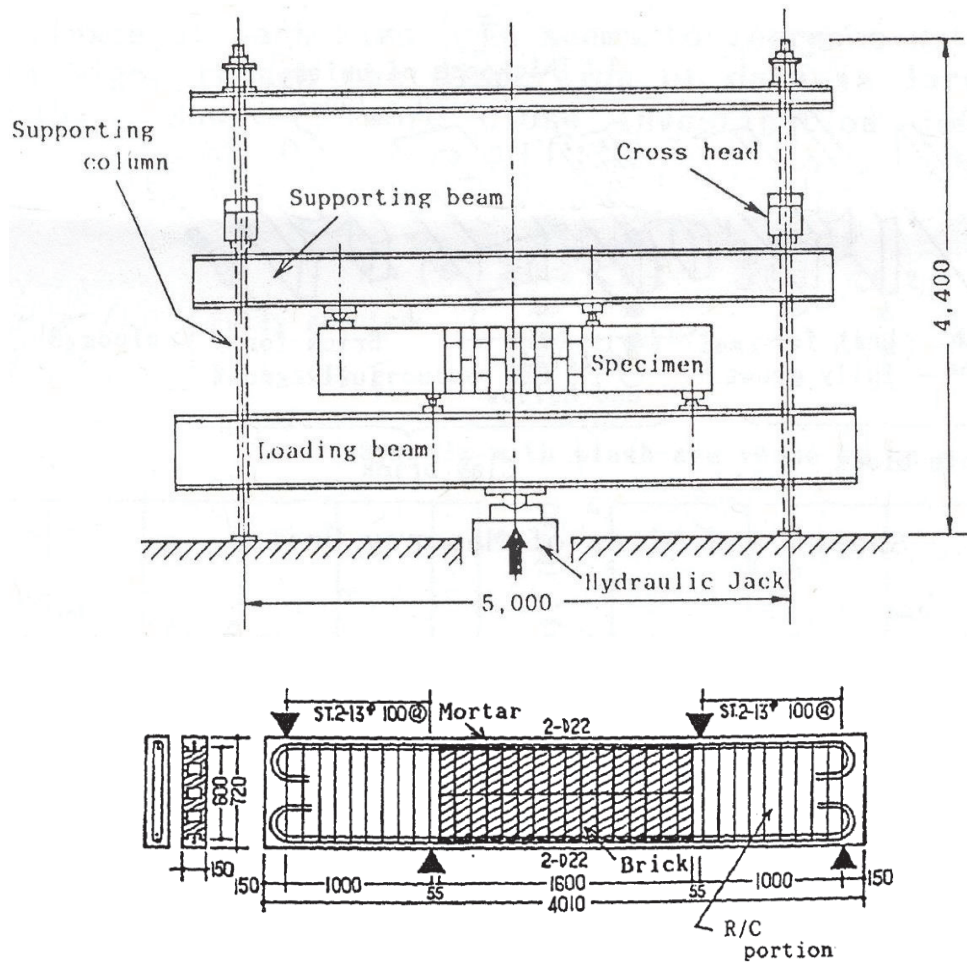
In-plane masonry beam shear test (Matsumura, 1988)
